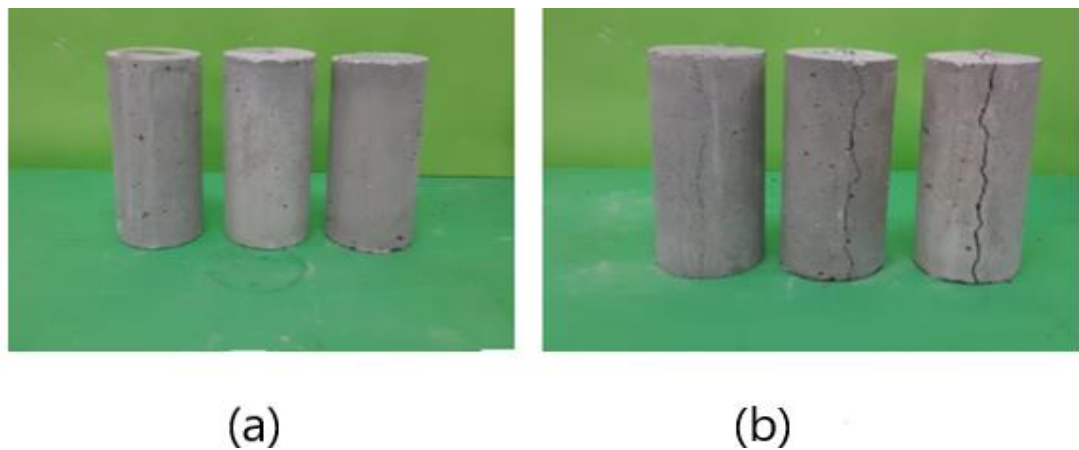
(a) Specimens before split test (b) Specimens after split test.
